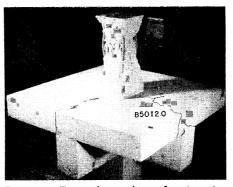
Typical cracking for interior column specimens, Type I (beam series)
